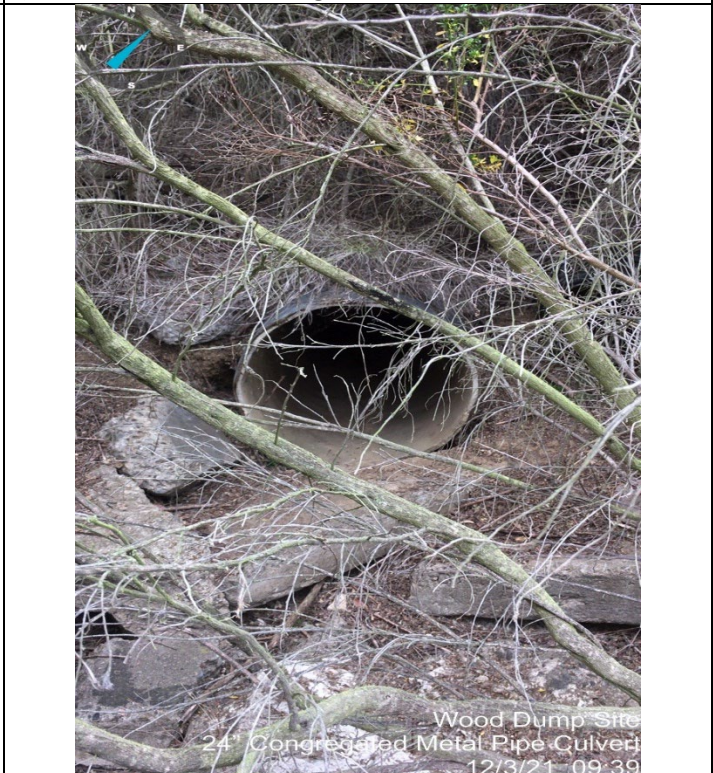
24-inch corrugated outlet pipe and reinforced concrete structure (north side of Site), facing south.
